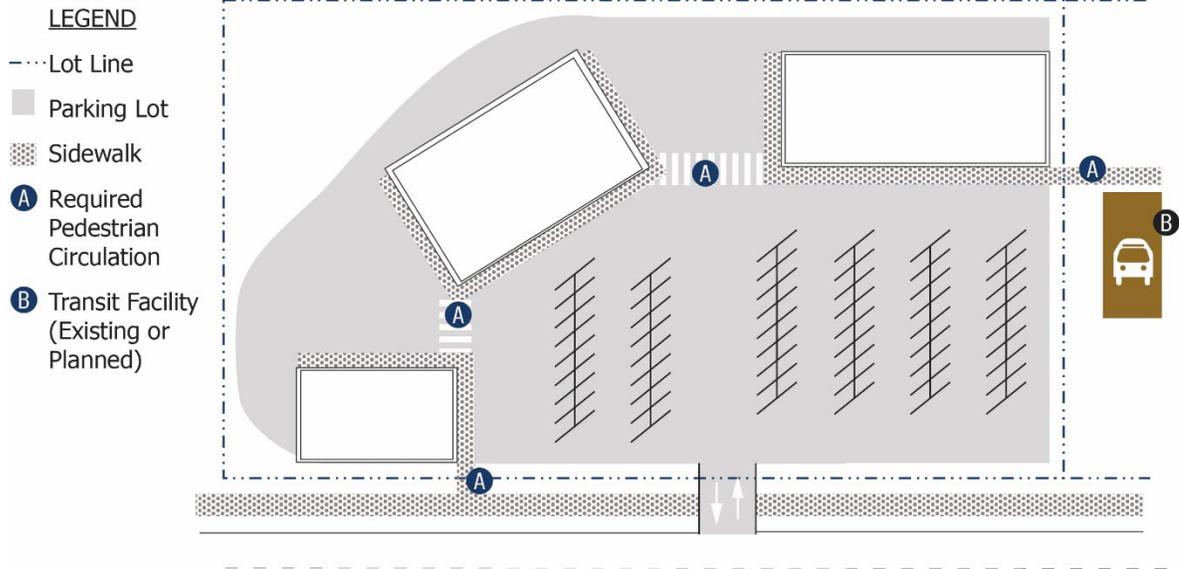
H: PARKING LOT CONNECTIONSLEGEND
